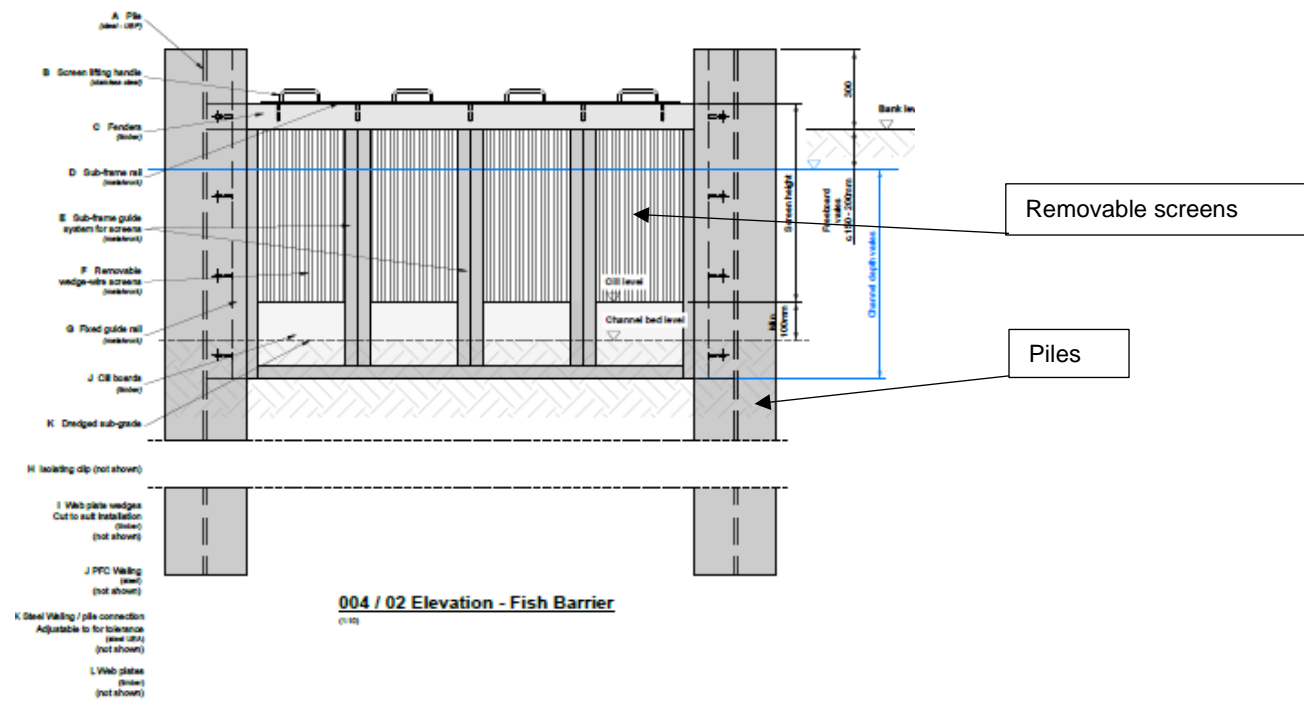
Design of Fish Barrier – Section Extract from Drawing 003
